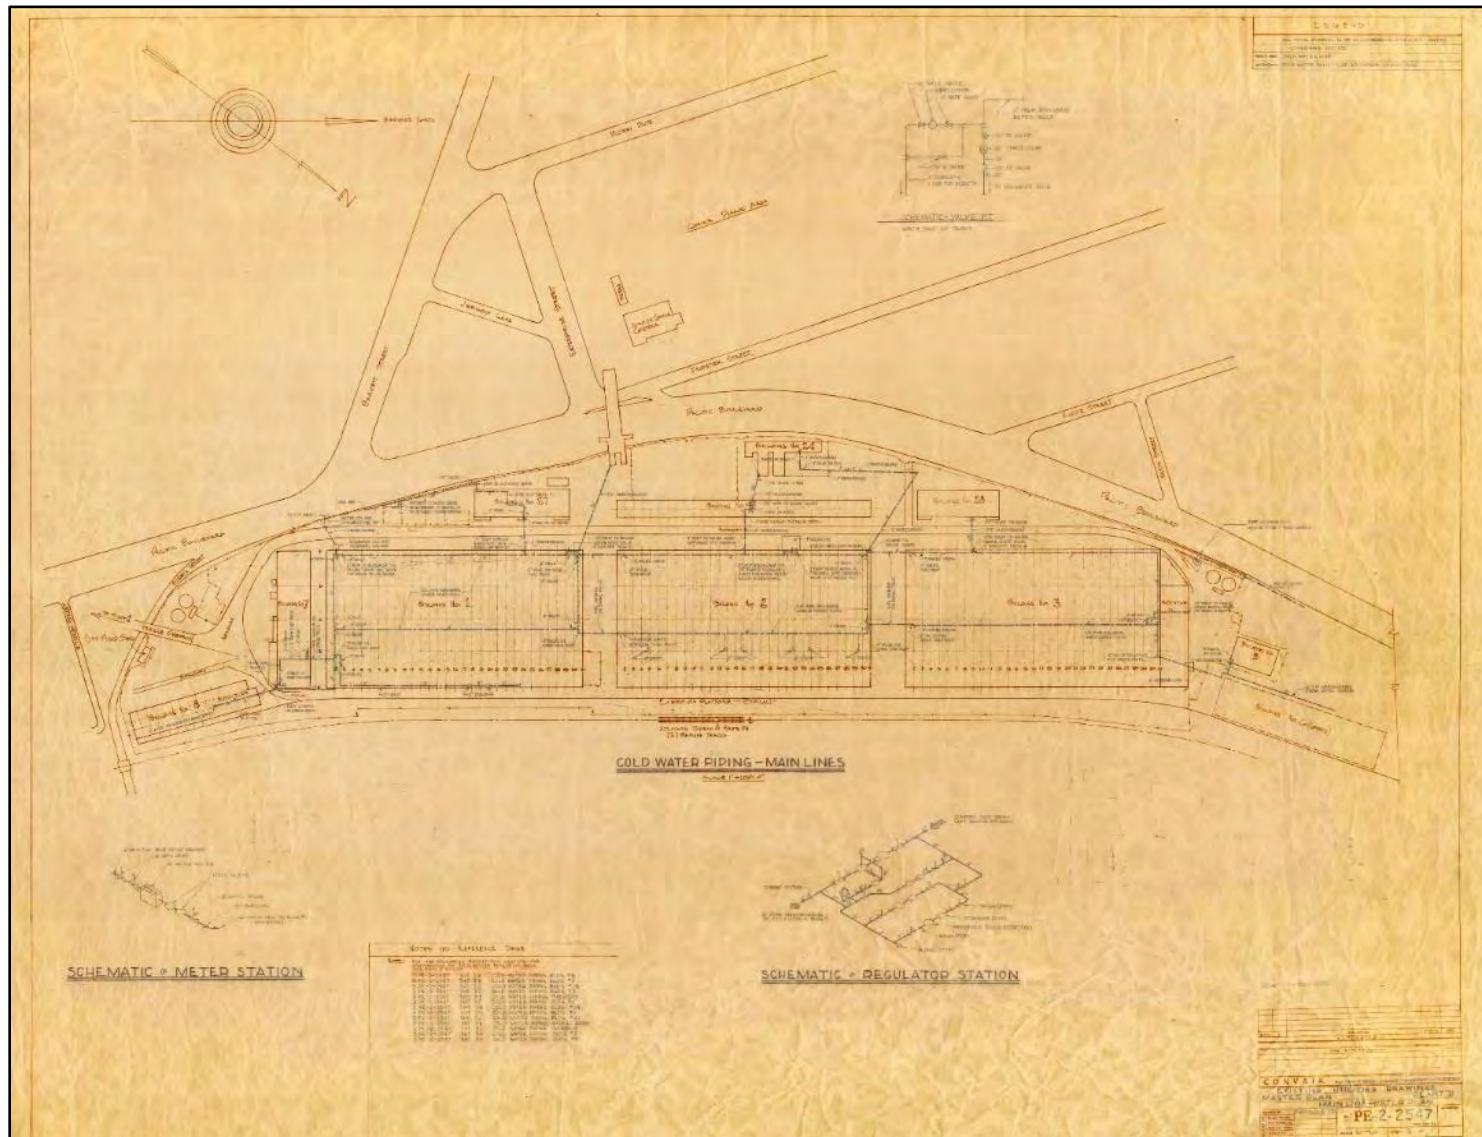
Plant 2 Master Plan, June 1, 1955.
